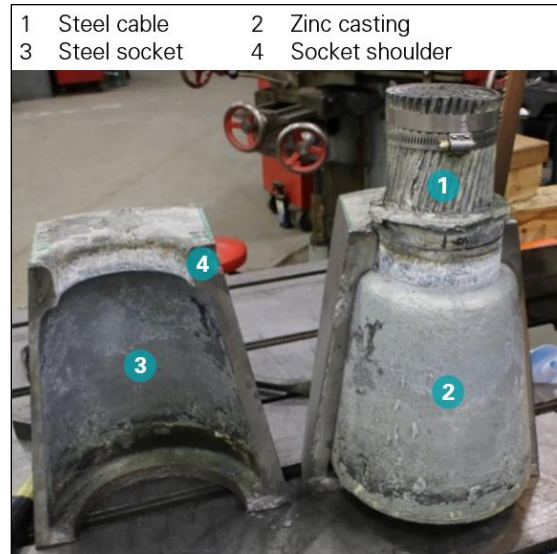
Zinc casting of auxiliary backstay socket B4N_G (photo: Socotec).
